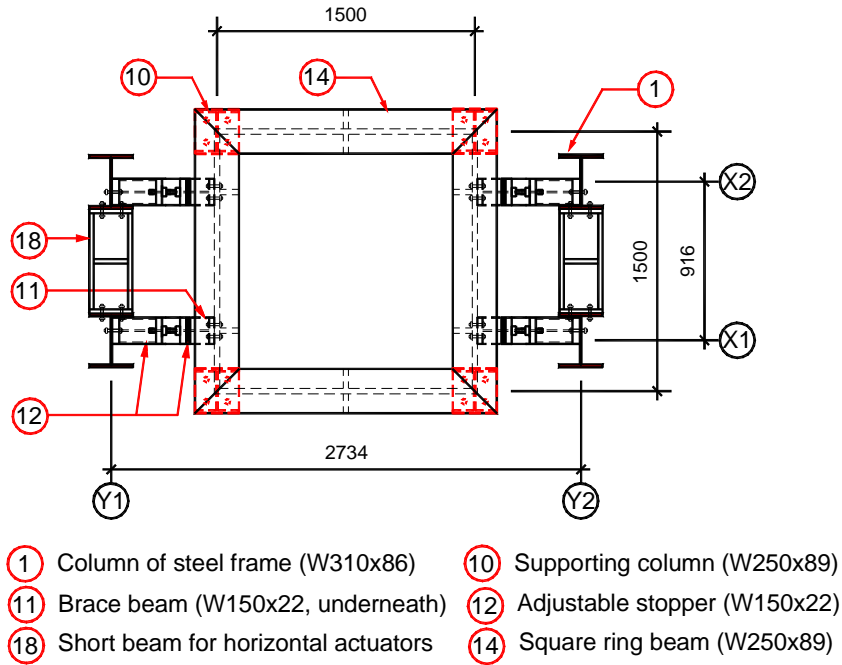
Plan view of the square ring beam, bracing beams, and adjustable stoppers
